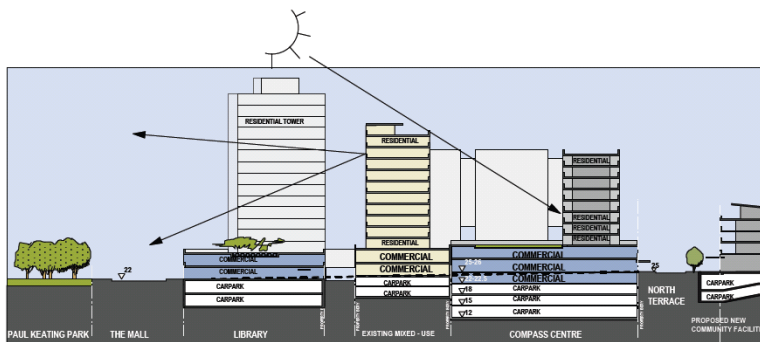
Proposed building envelope for mixed use development on this key strategic site as viewed from The Appian Way (not to scale)
